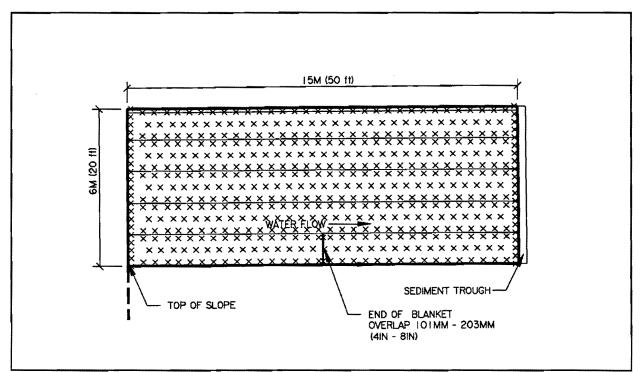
GEOJUTE® PLUS 1:2 Installation Plan.
